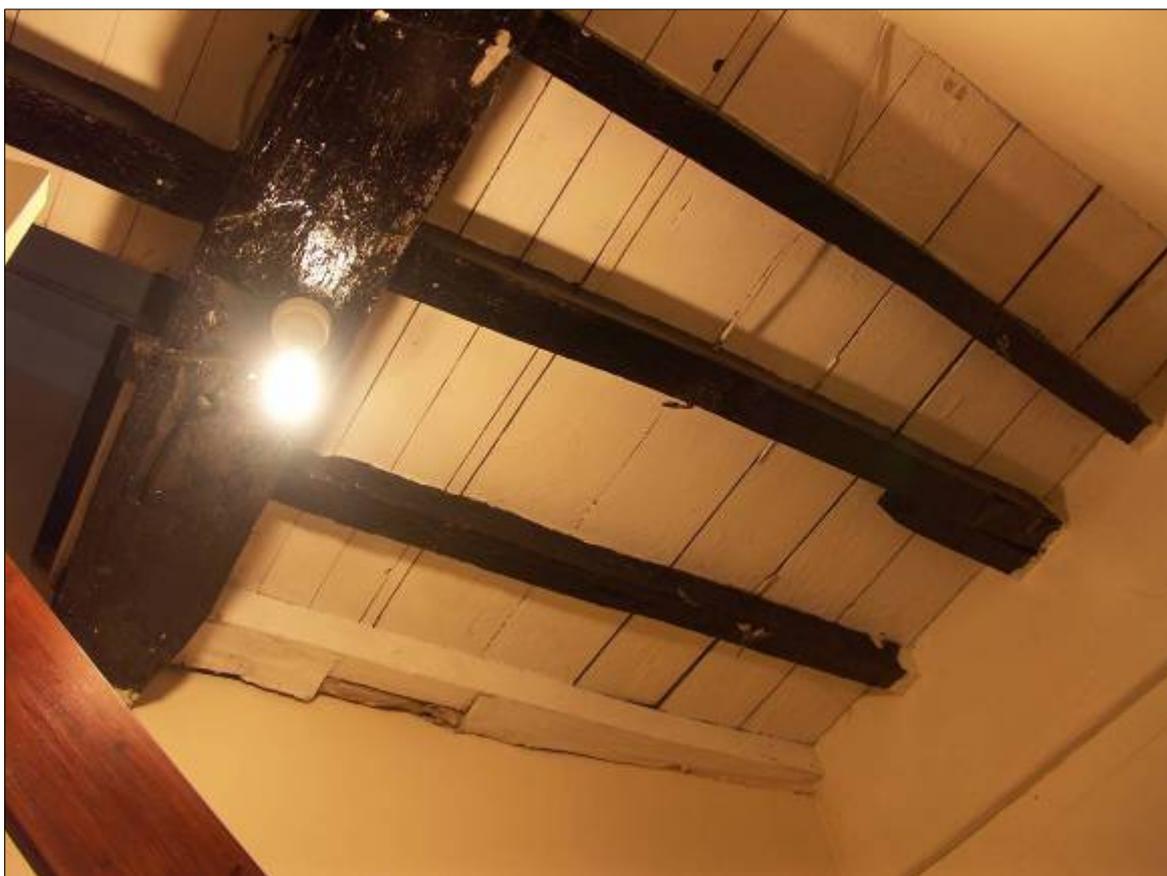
Ground floor of Building F. Interior showing original timber floor boards of the first floor.
